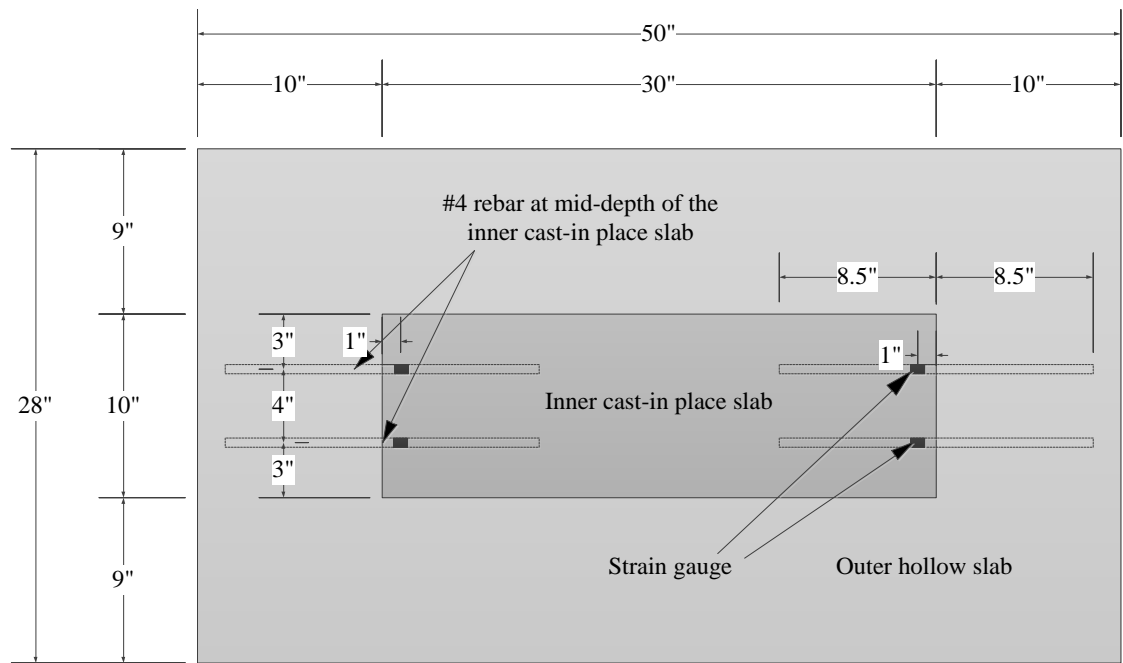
Specimen details for punch test specimen with No. 4 rebars and cast-in-place PC.
